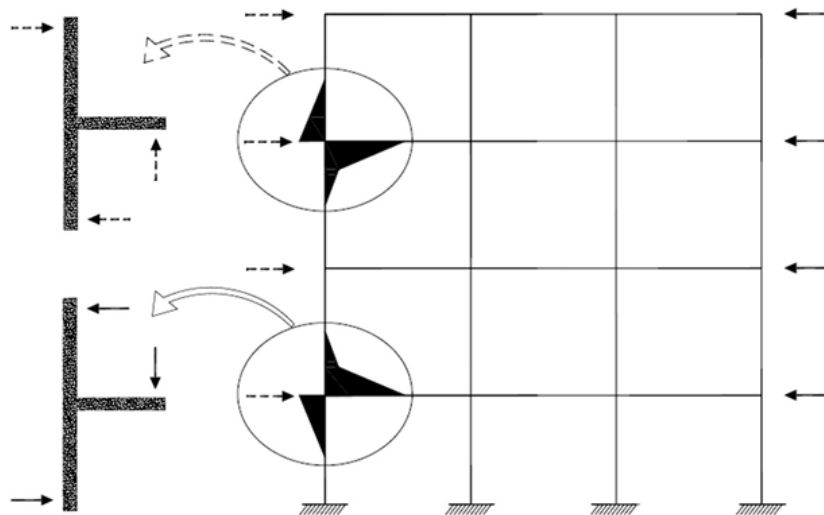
4 Typical RC Frame (Rajgopal et al. 2015)
